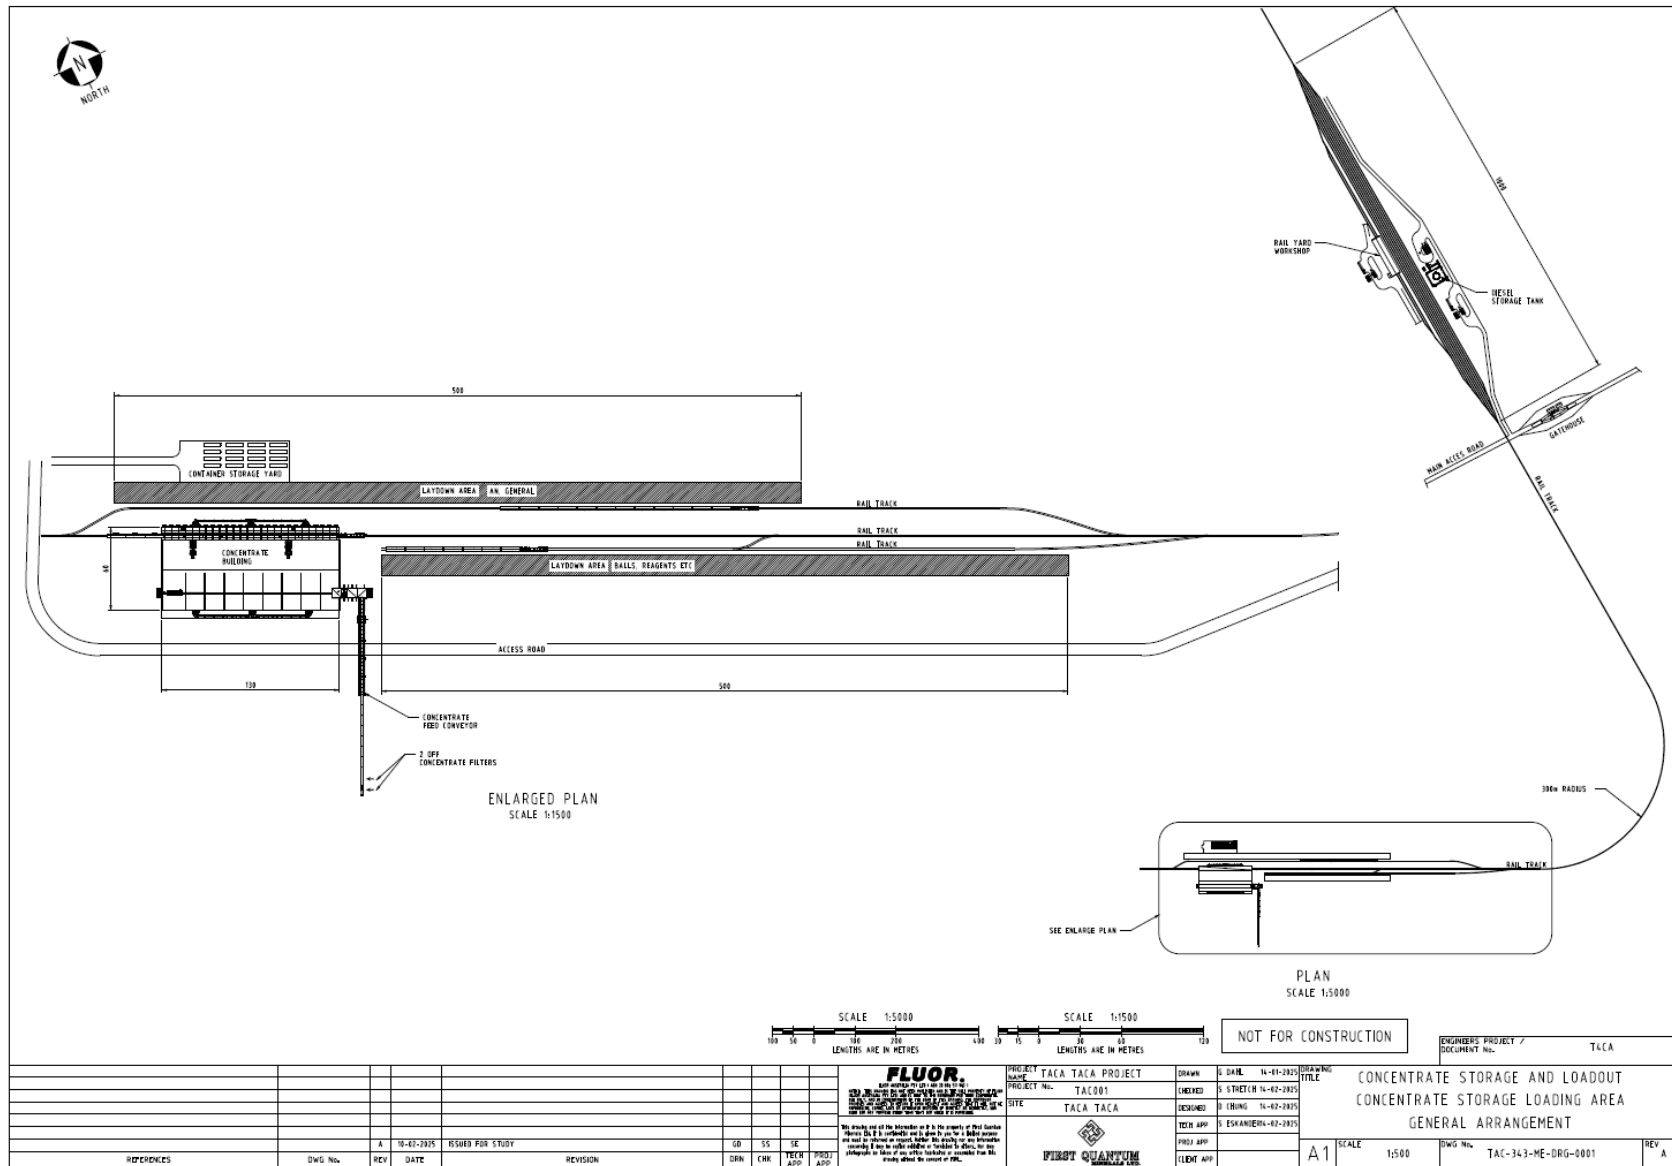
Layout of rail sidings and concentrate loadout (source: Fluor, February 2025)
